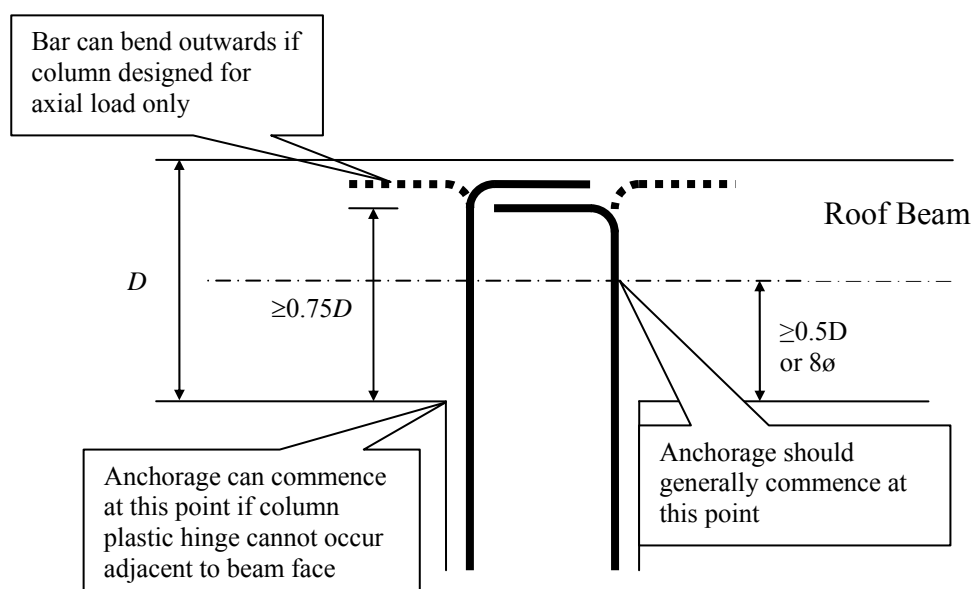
Column Bar anchorage in Beam (Roof Beam)
